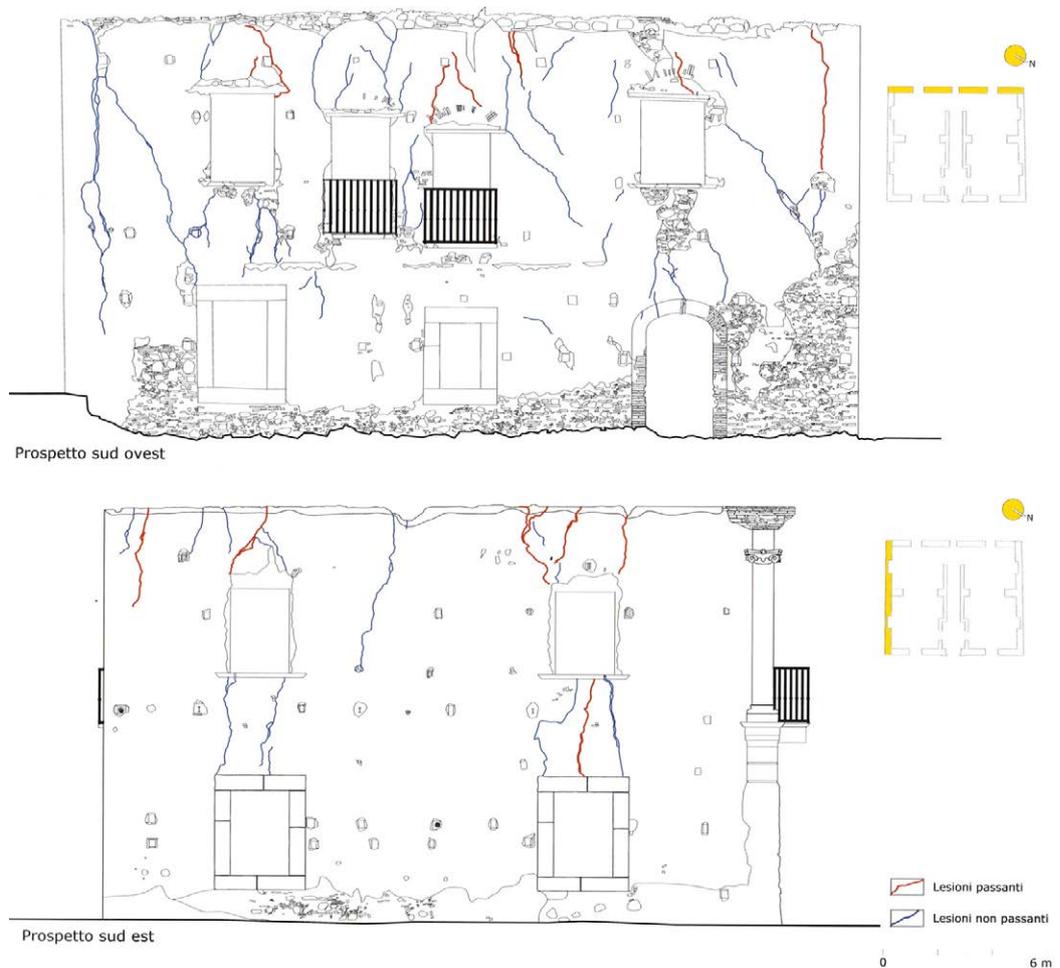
Portanova Palace, Reggio Calabria. Southwest and southeast elevations, crack framework [Valtieri 2016, p. 78].
